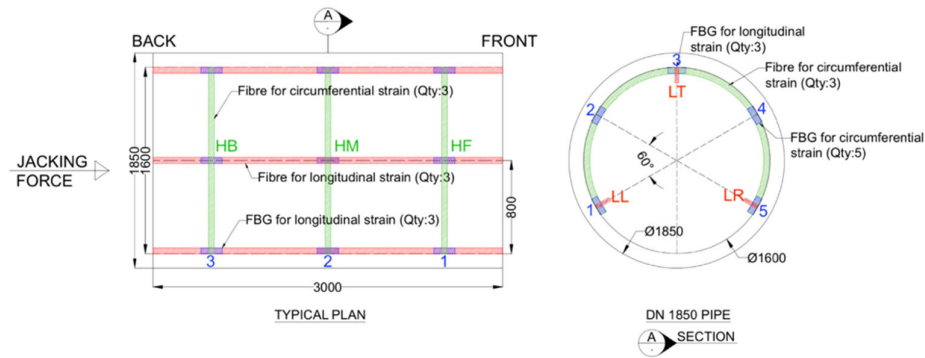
FBG sensor configuration (a) plan view and (b) cross-section view (dimensions in mm) (Jiang et al. 2019)
